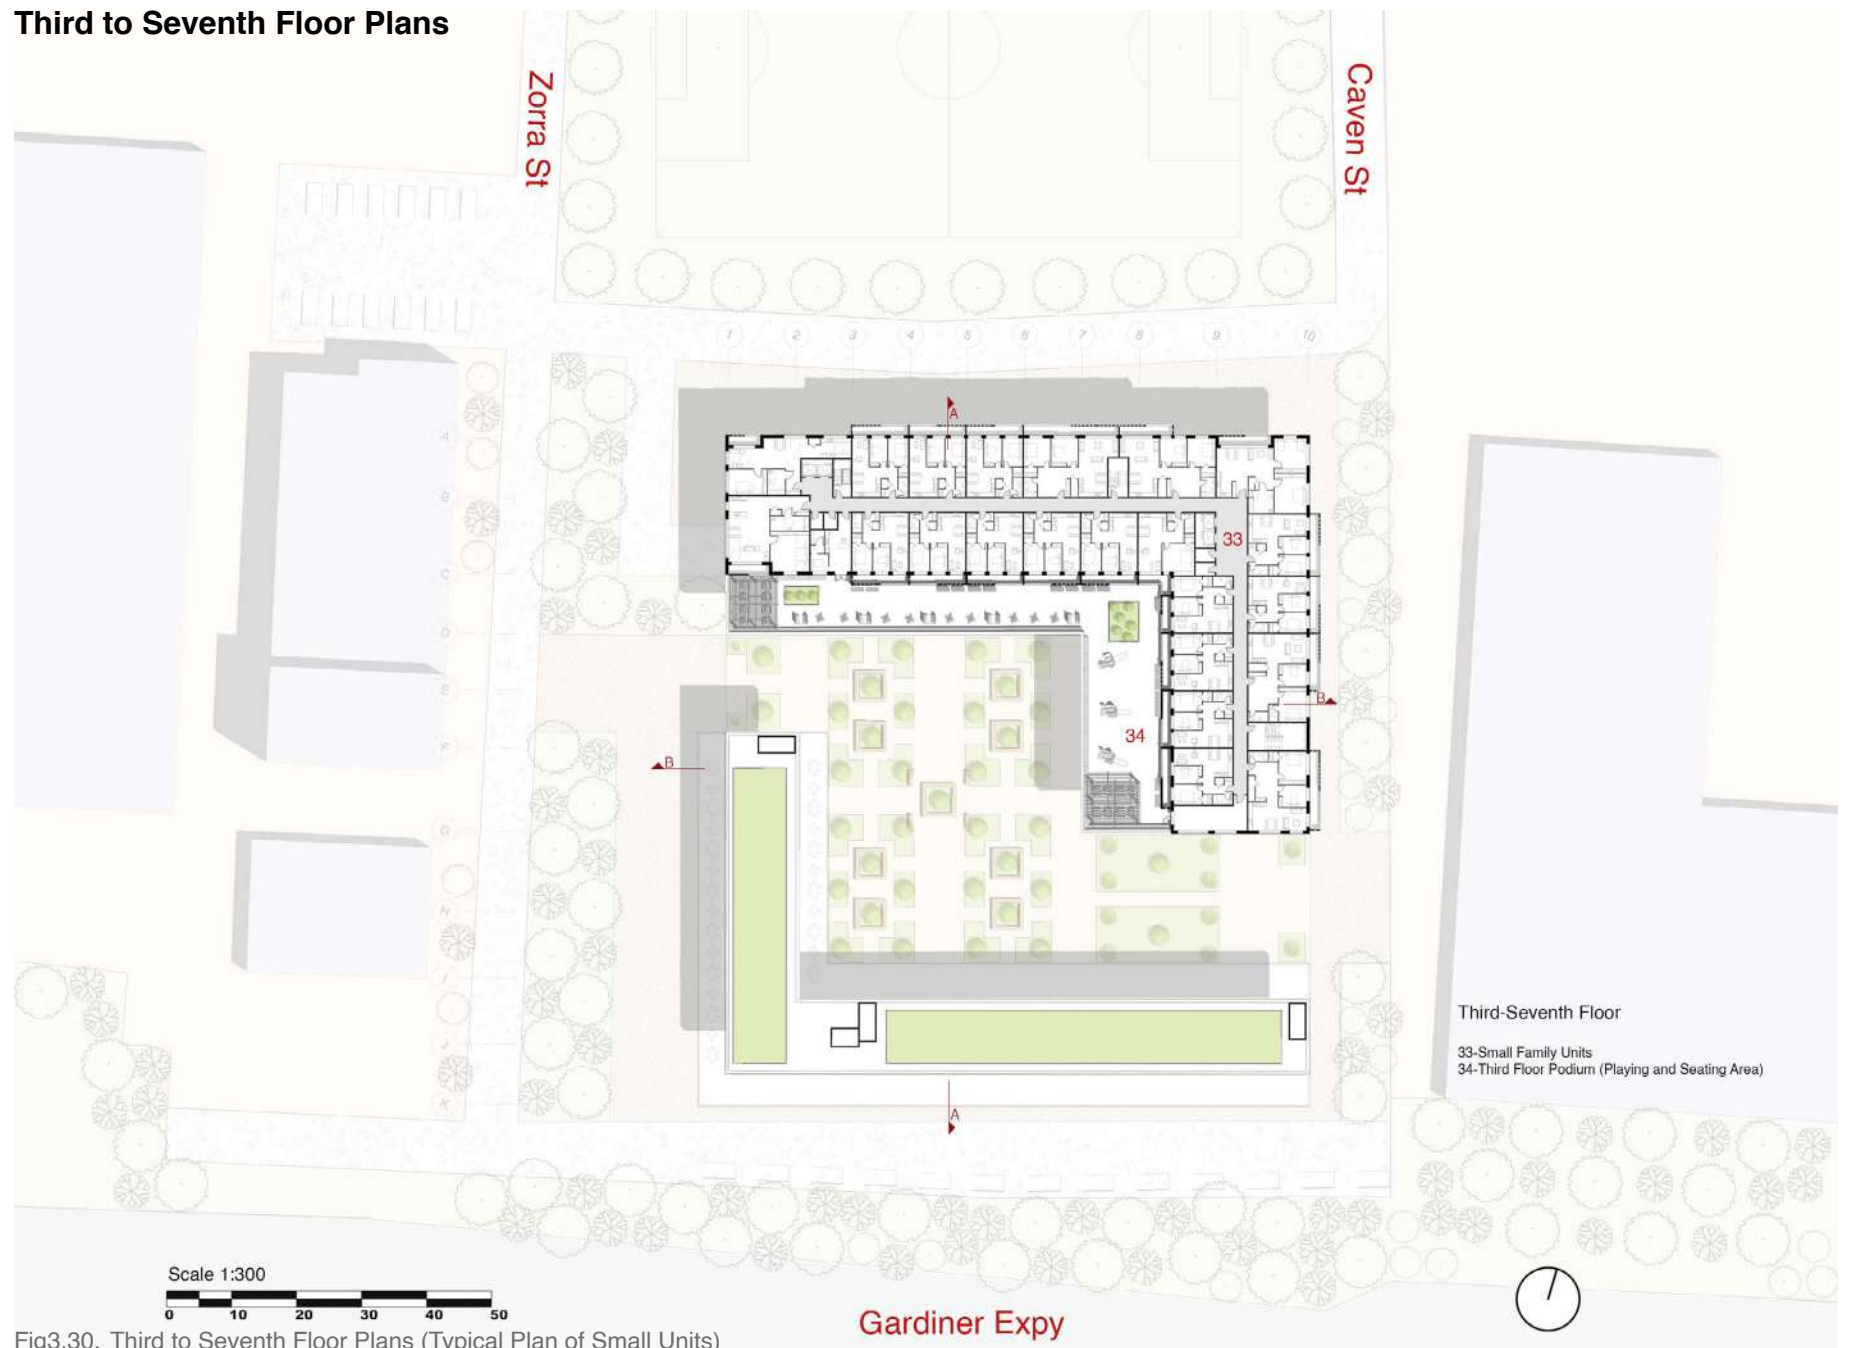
Third to Seventh Floor Plans (Typical Plan of Small Units)
